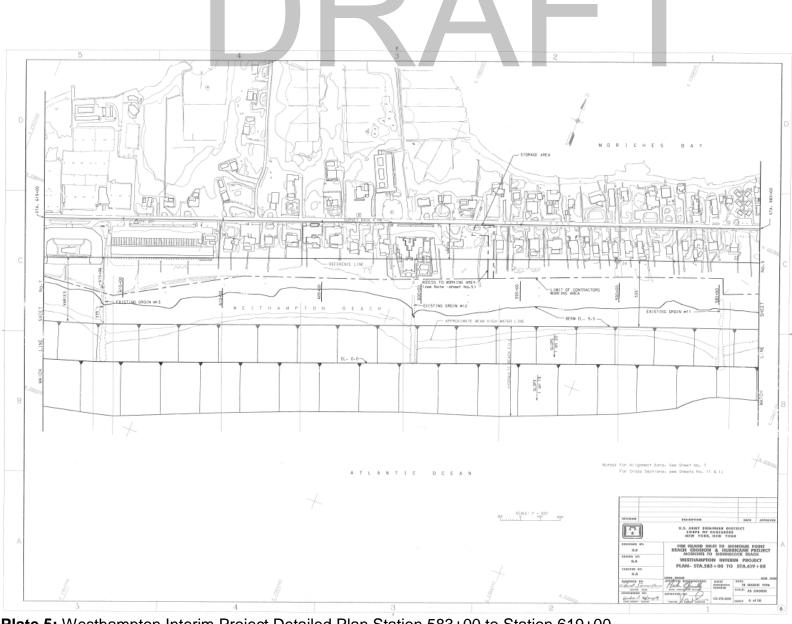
Westhampton Interim Project Detailed Plan Station 583+00 to Station 619+00
